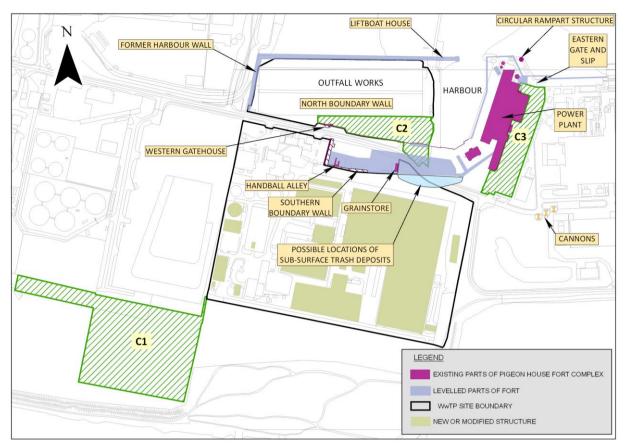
Plan of the Pigeon House Fort from Giacommetti 2009 superimposed on a plan of the Proposed WwTP Component
